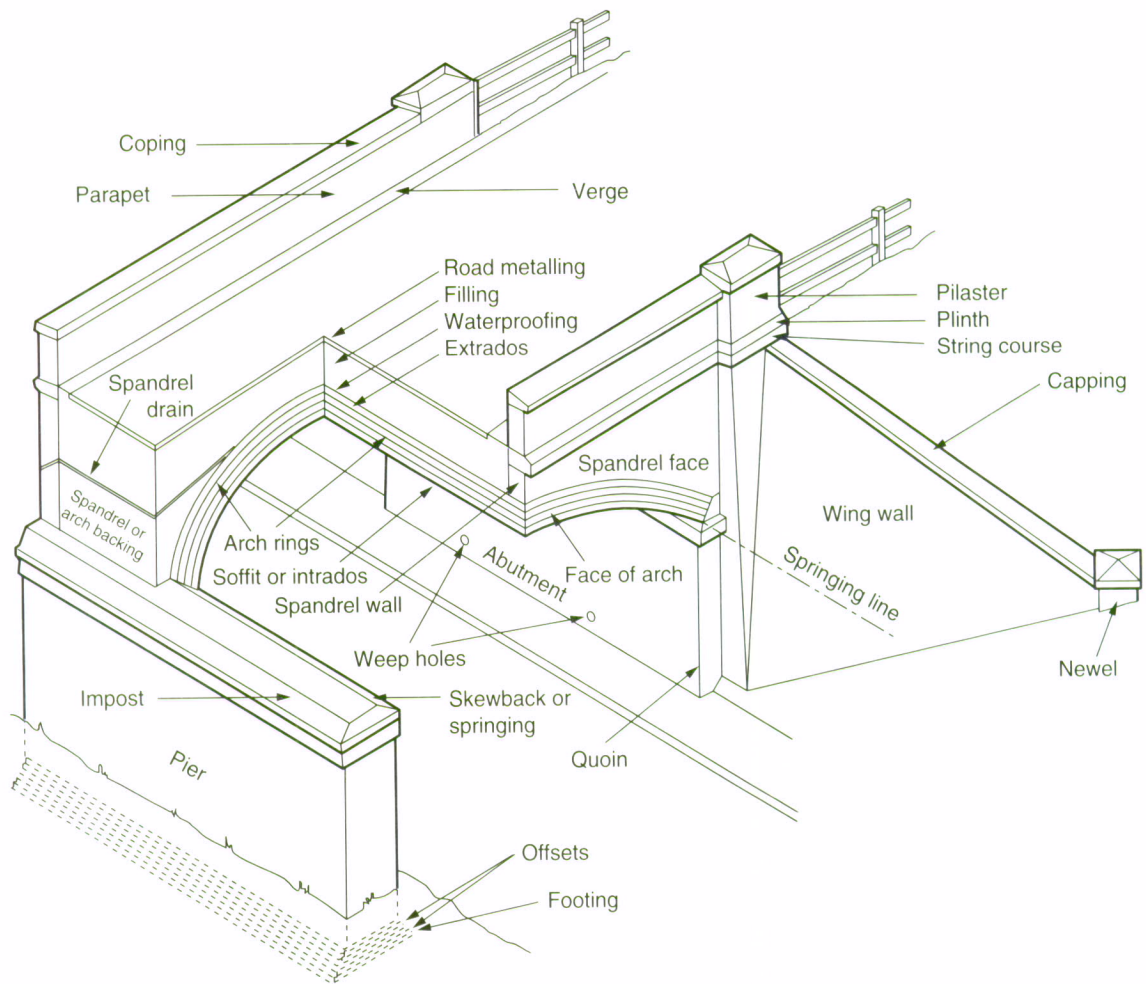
Typical construction of a masonry arch bridge (Source Sowden, 1990)
